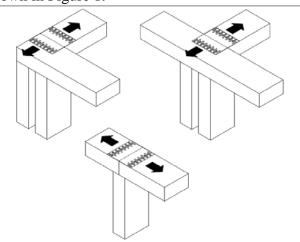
Strap Nail applications, top plate corner and intersection and top plate butt joint.
